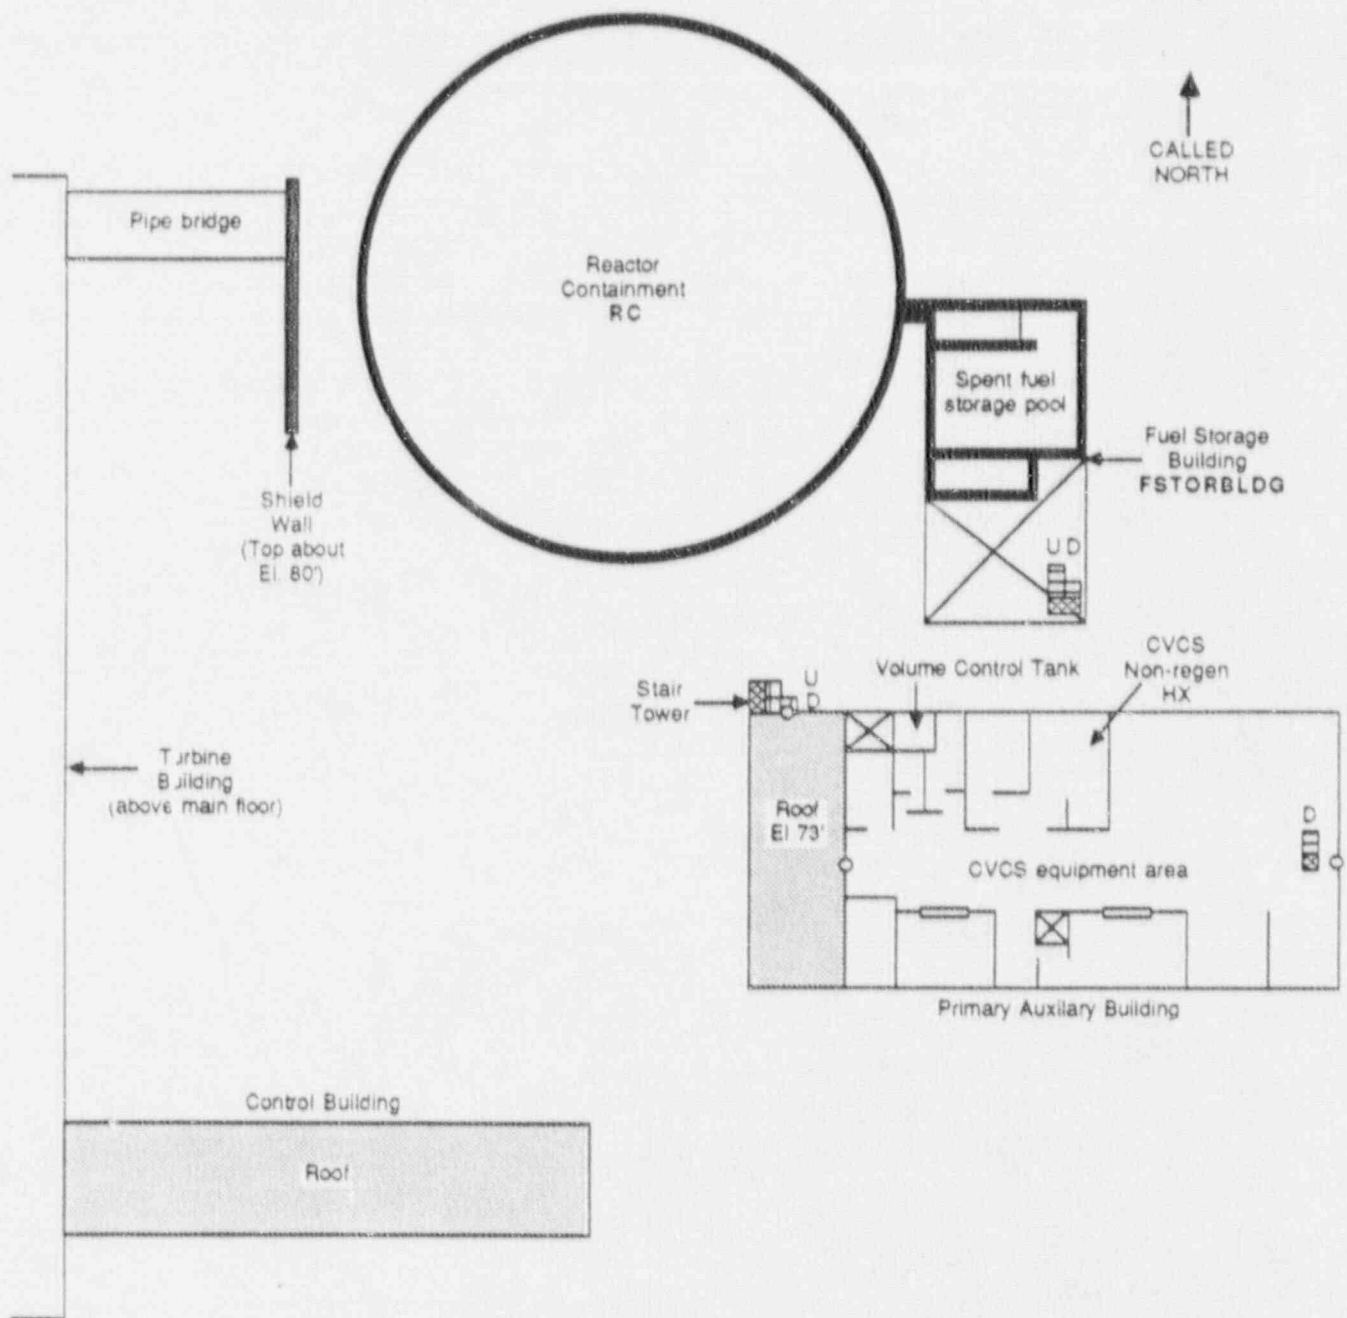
Indian Point Unit 3 Station Arrangement Elevation 73'
